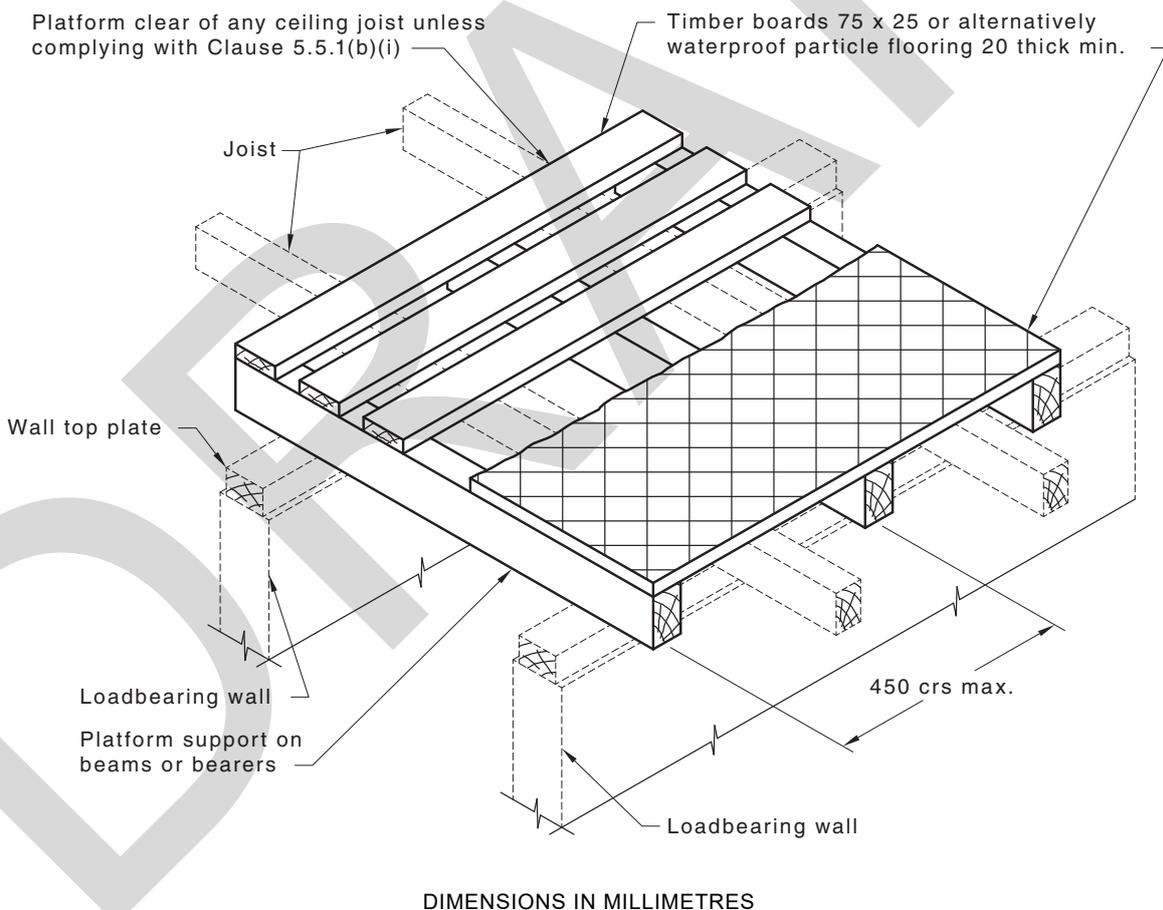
TYPICAL CONSTRUCTION OF A PLATFORM
